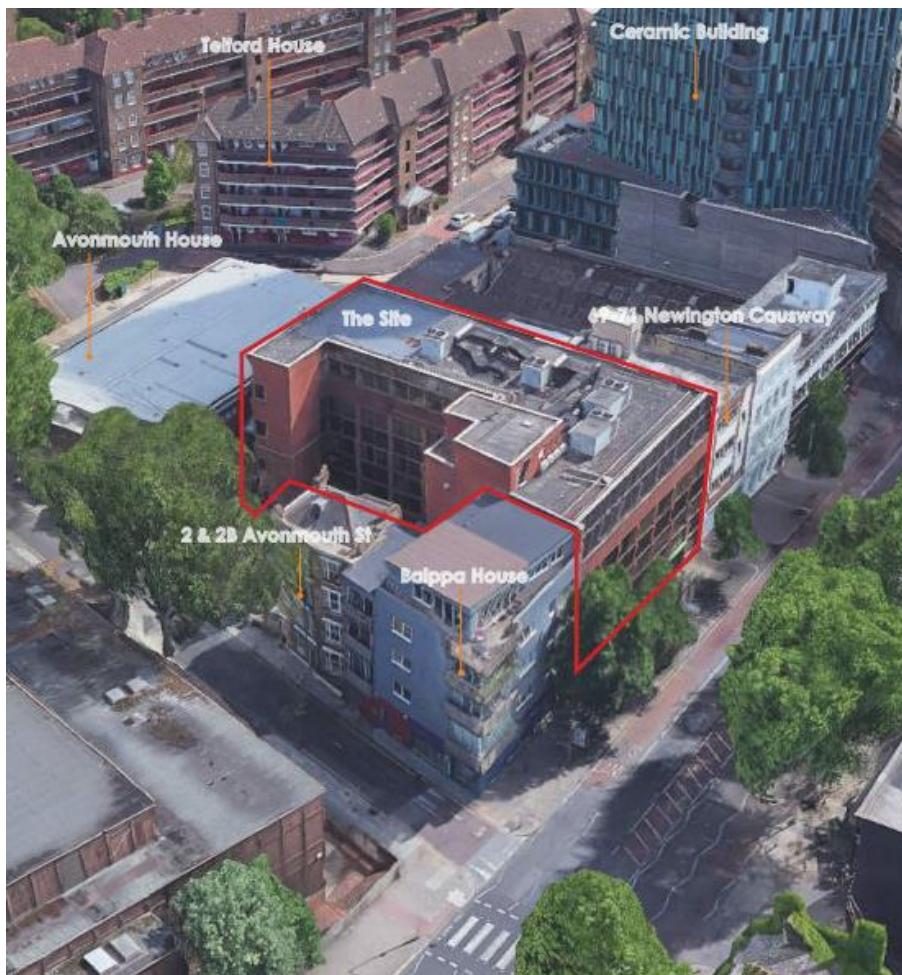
, Nos.73-75 and Southwark Playhouse are to the right of the existing building on site
